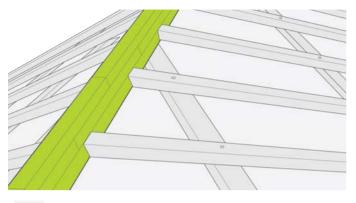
FIXING BATTENS FOR A BEVELED RIDGE
